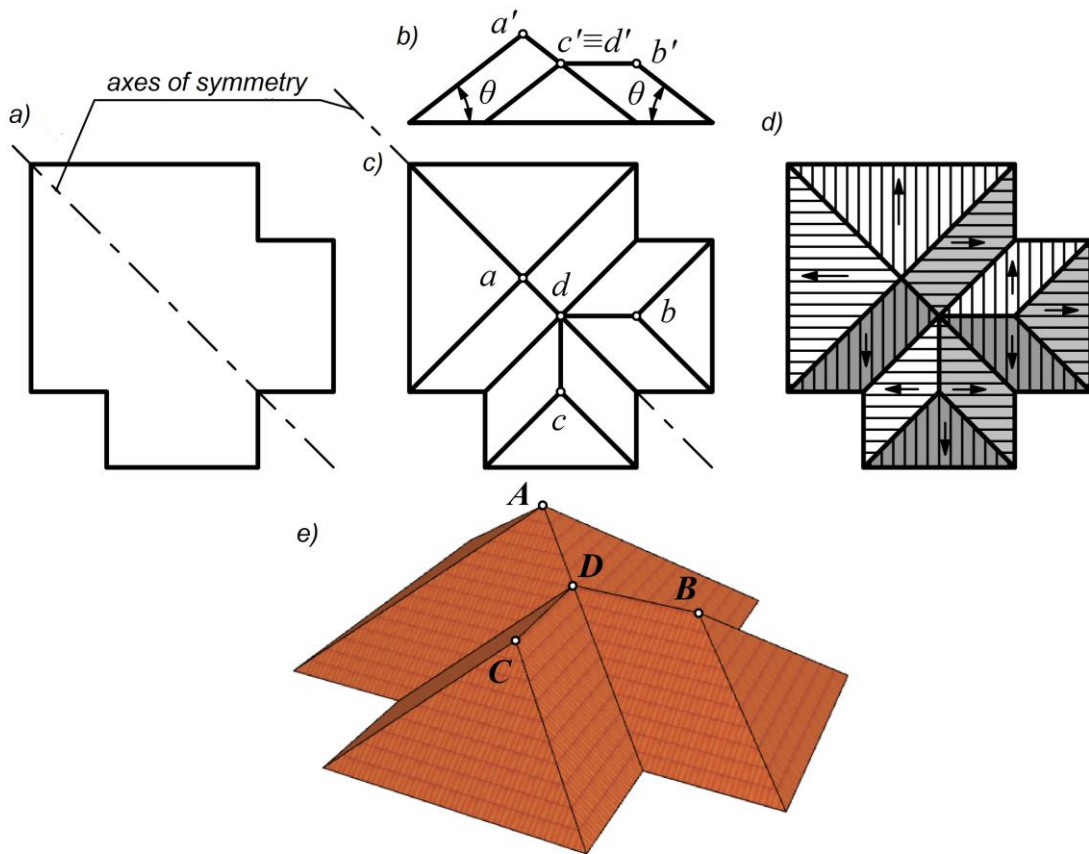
The roof of a symmetrical building: a – initial data; b and c – frontal and horizontal projections, respectively; d - top view; d - perspective
